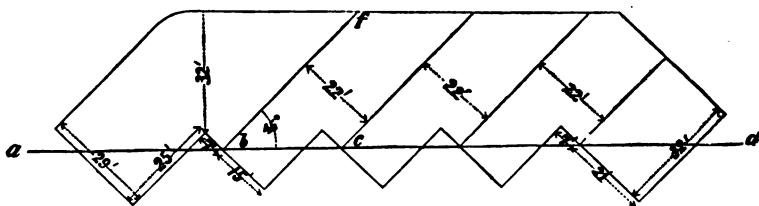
TRACE OF AN ELEVATED BATTERY.
